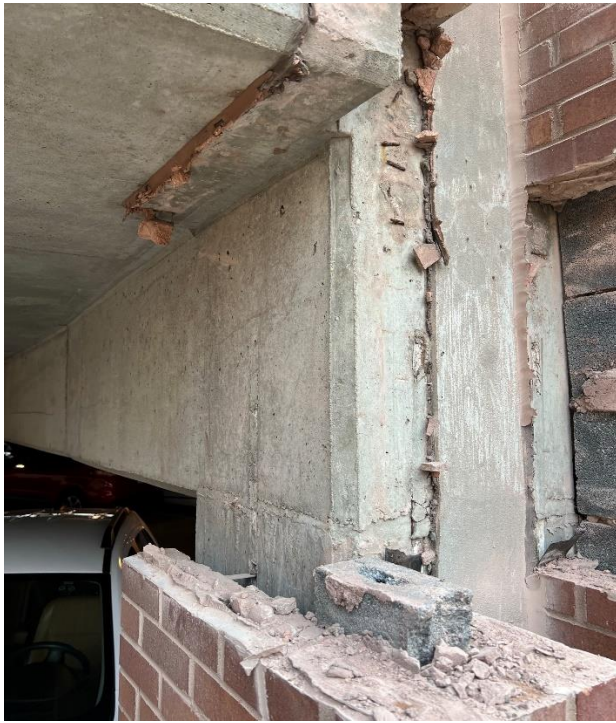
Column 19A inspection opening at Level 2 PT beam end (brick veneer at concrete block infill removed).
